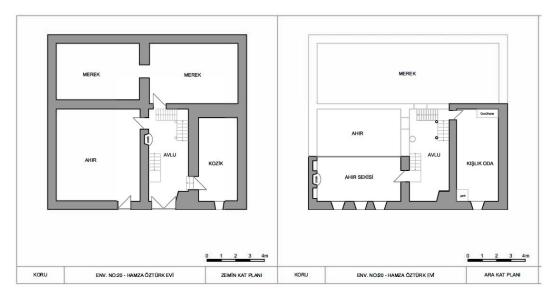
An Example of a Village House Plan Scheme with Stable Mezzanine and Winter Room.
